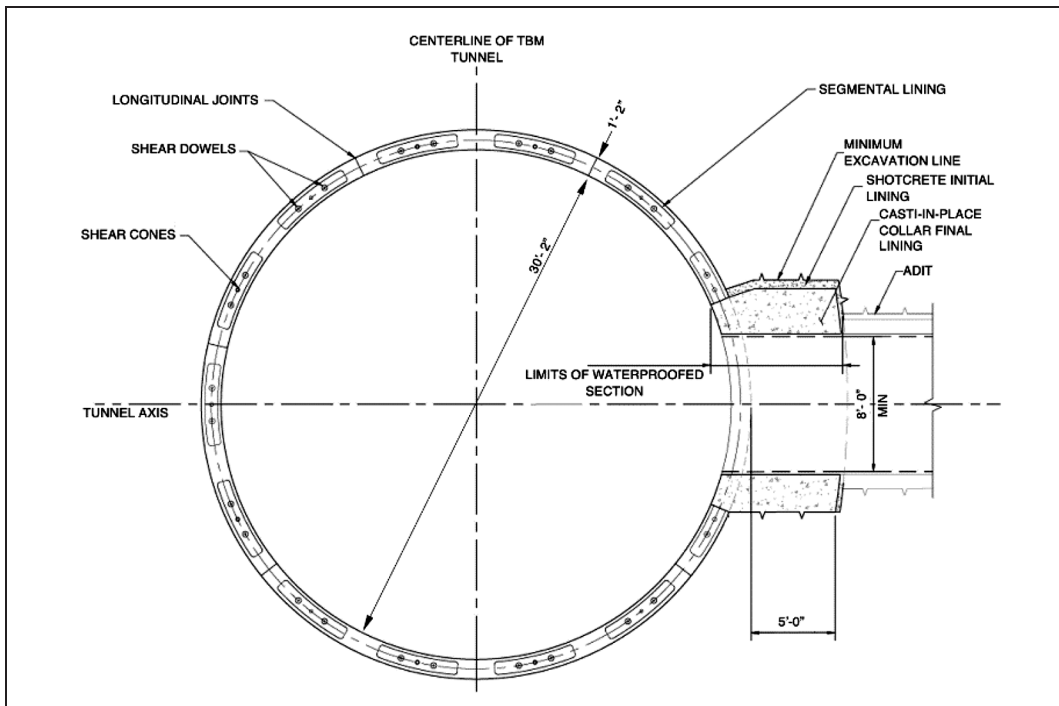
TBM adit opening ring cut with final cast-in-place concrete collar and adit
